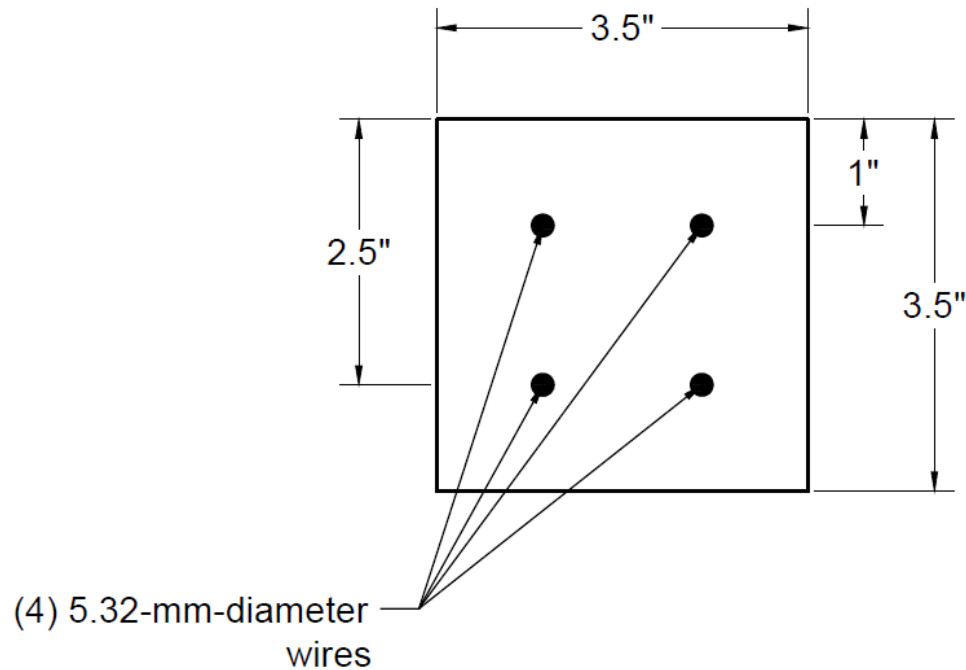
Cross section of the pretensioned concrete prism (1 inch=25.4 mm)
